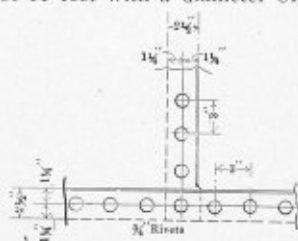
DETAIL OF RIVETING OF TOP RINGS.
